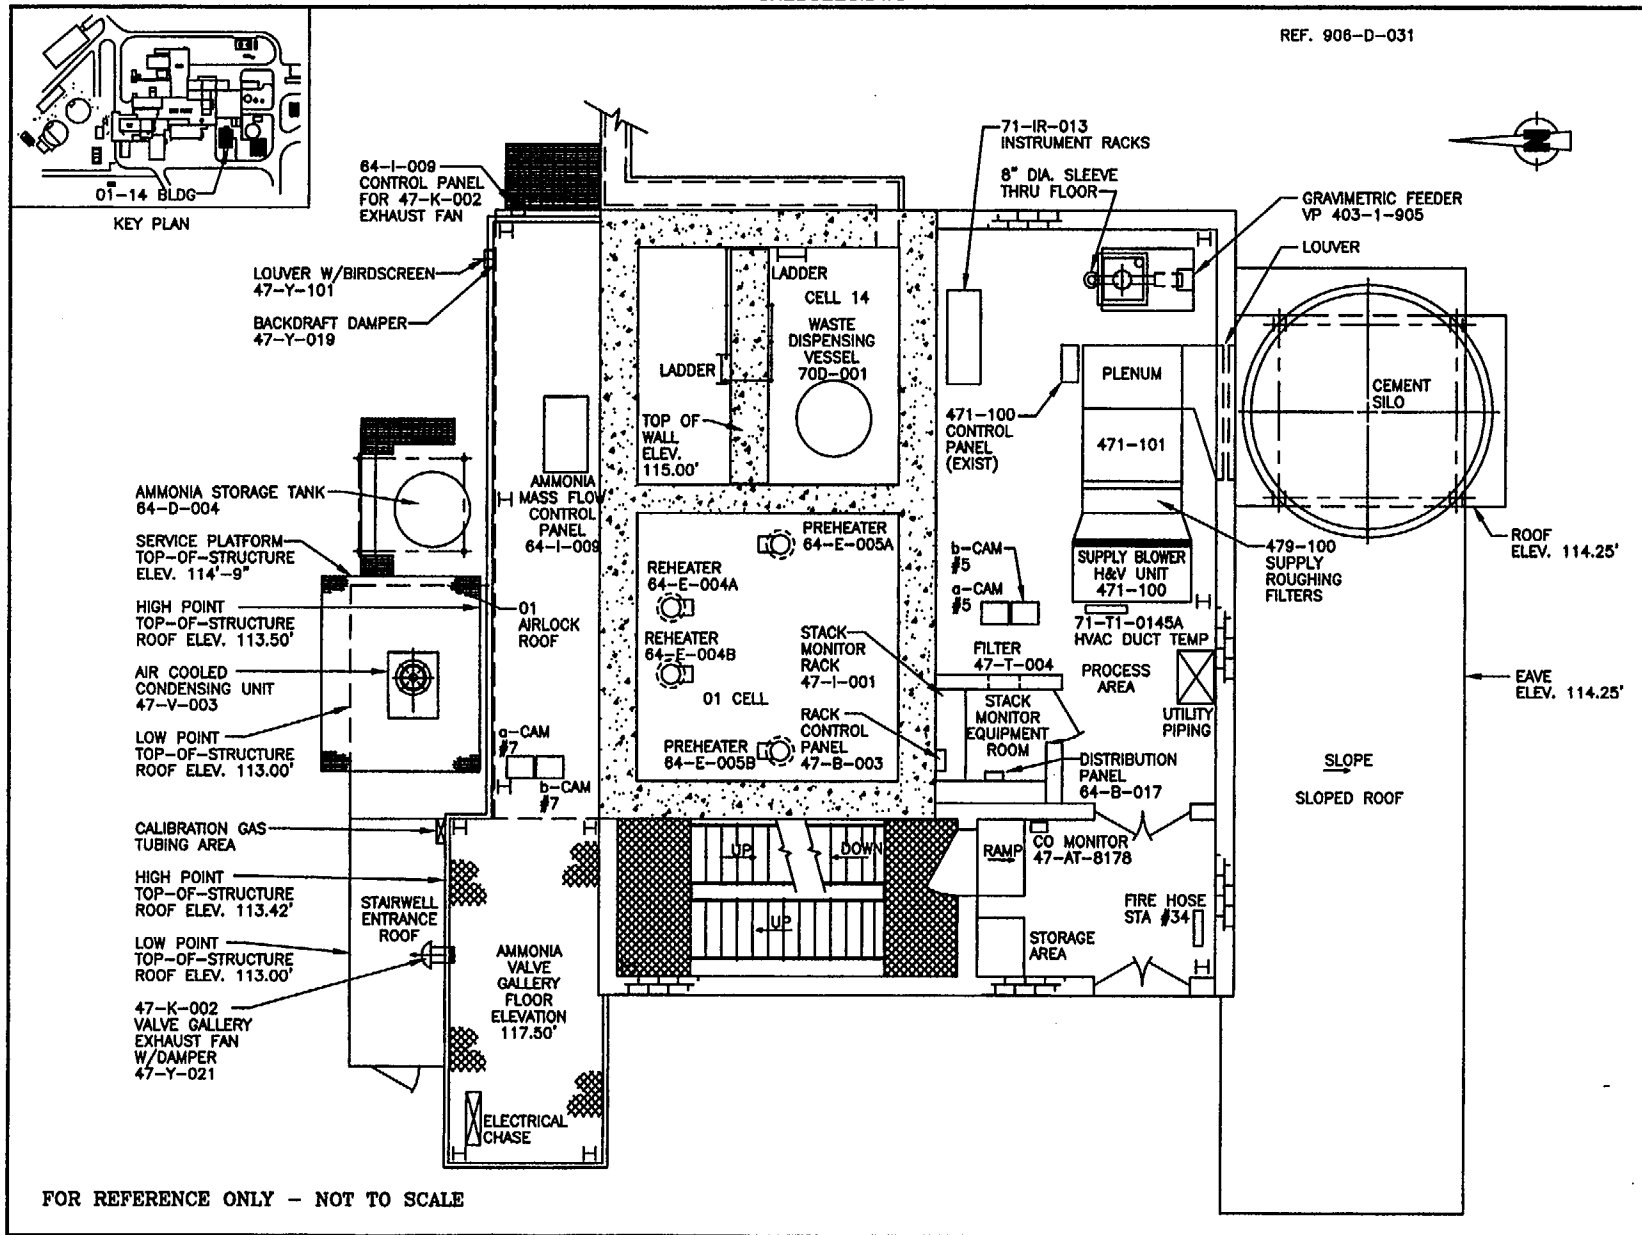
General Arrangement - 01/14 Building Plan Elevation 116.5'
